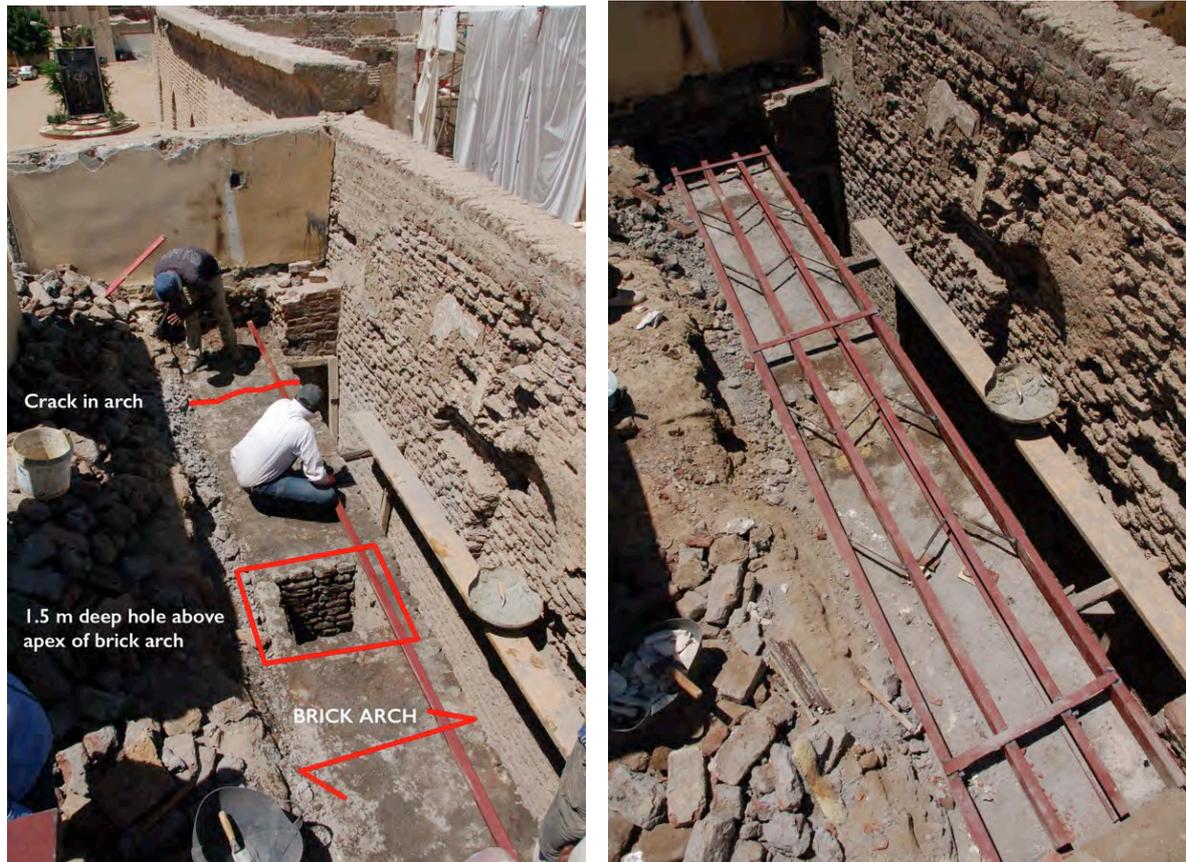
View of the brick north arch of the tower before and after insertion of steel reinforcing beams
